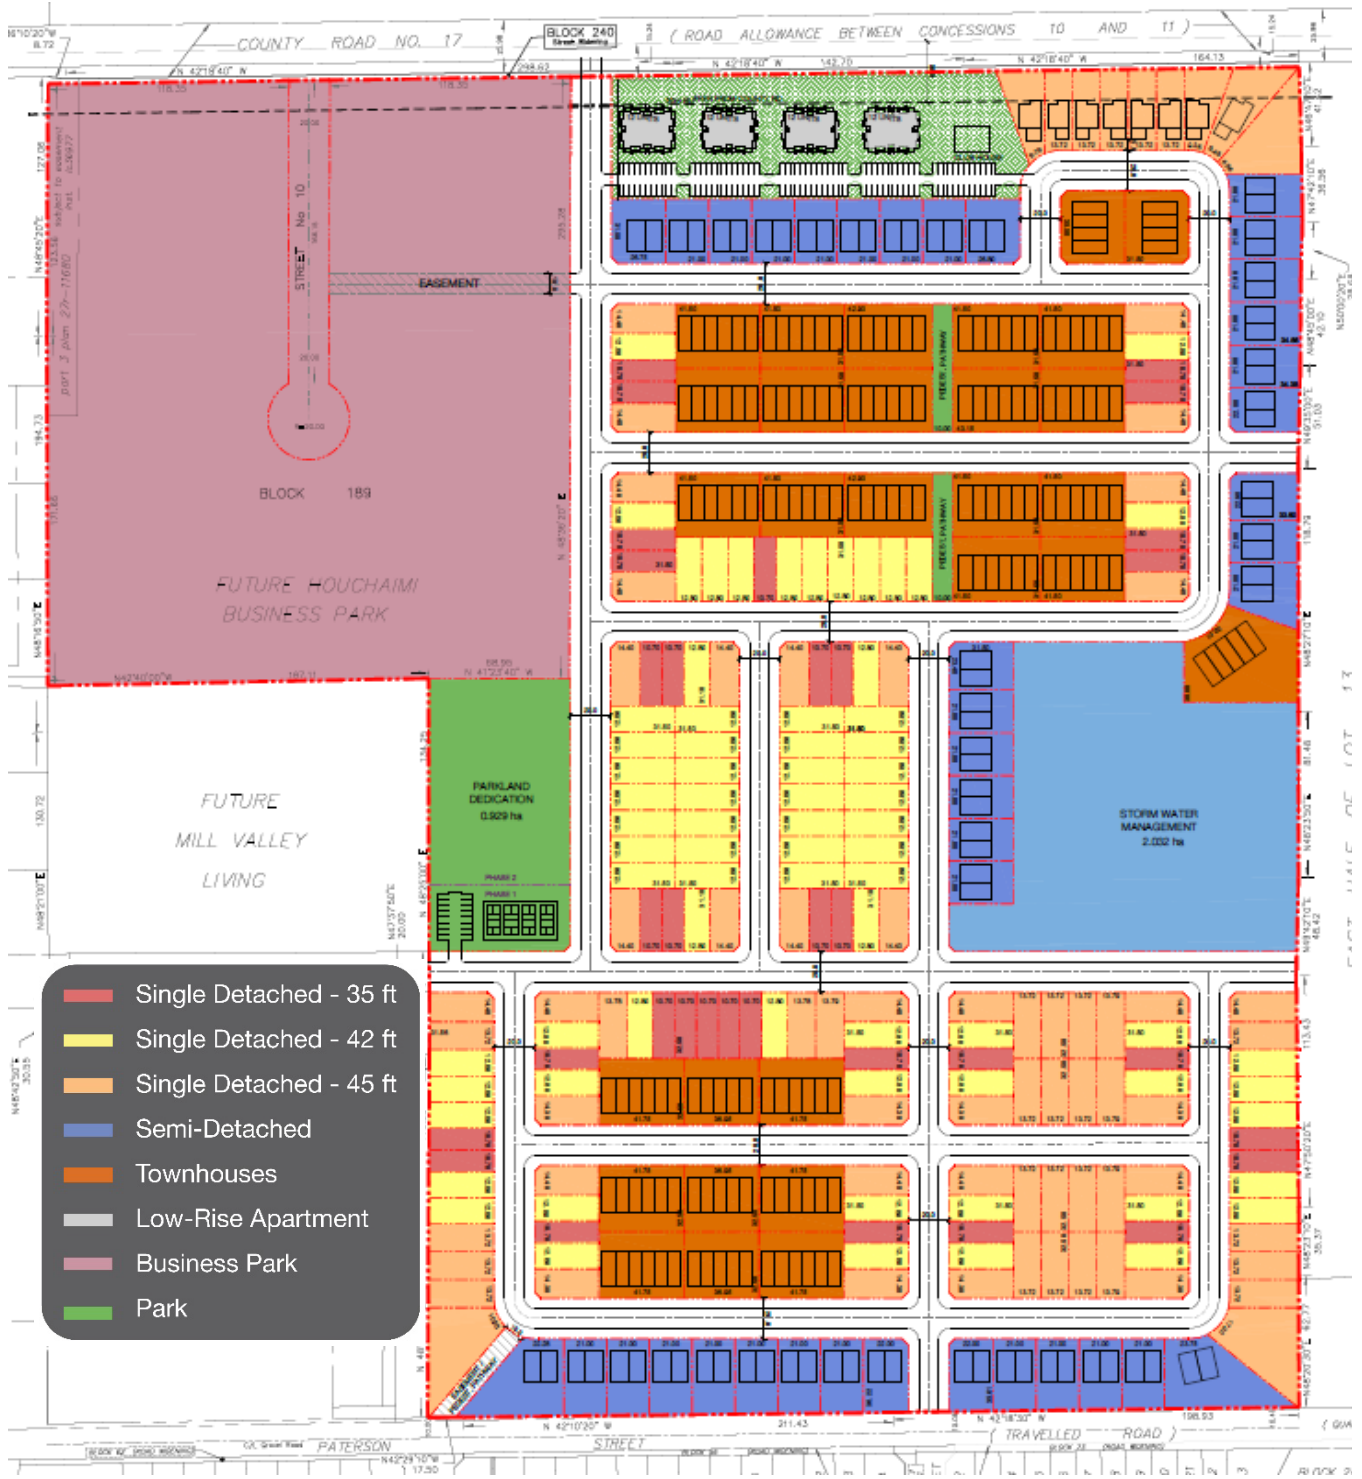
Proposed Unit Layout of Mill Valley Estates Subdivision
